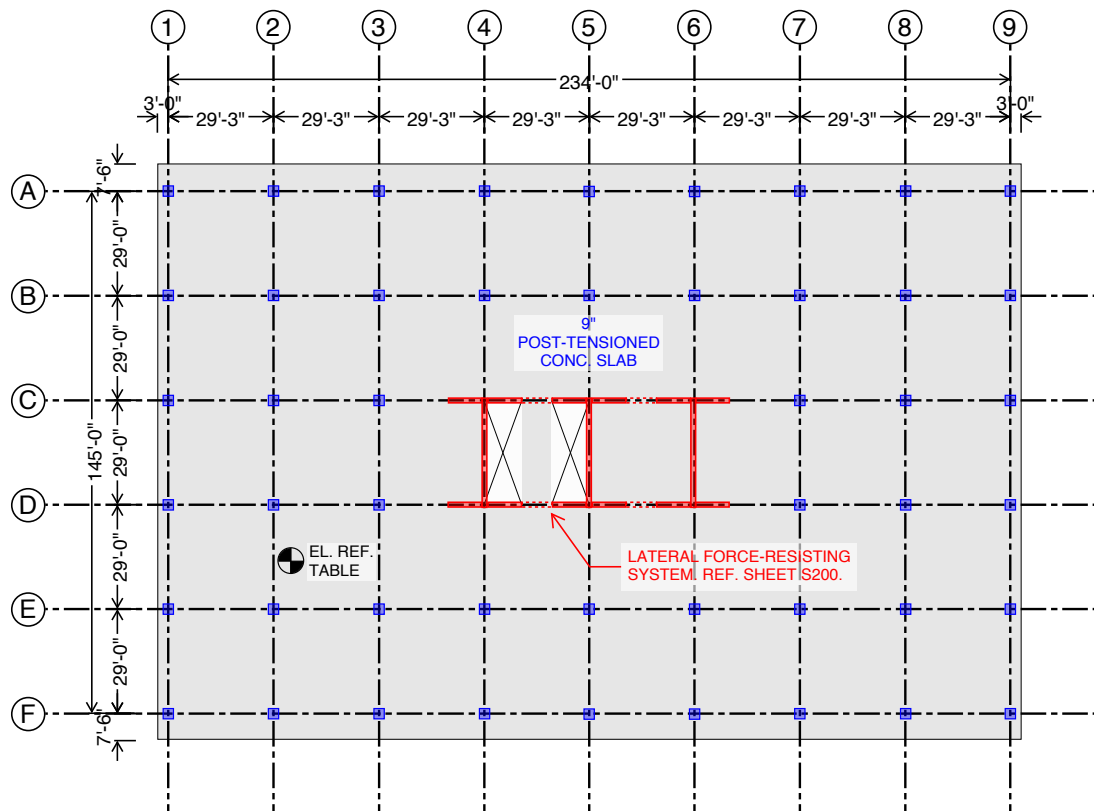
Typical upper floor plan for the large reinforced concrete office building
